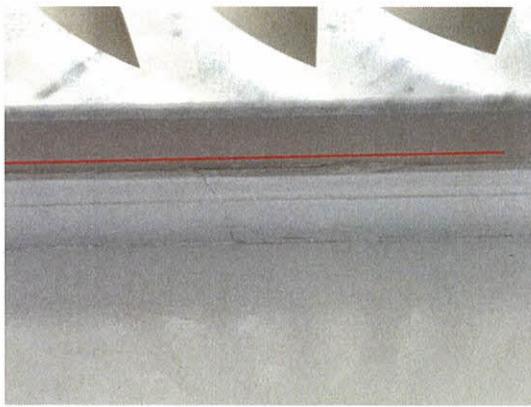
Separation of baseboard from wall below window sill created by the buffeting of windows from by Irma's wind pressures.
